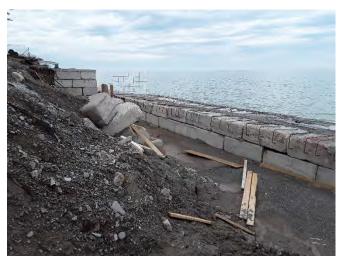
Site 12 Seabreeze Cr. adjacent protection under construction
